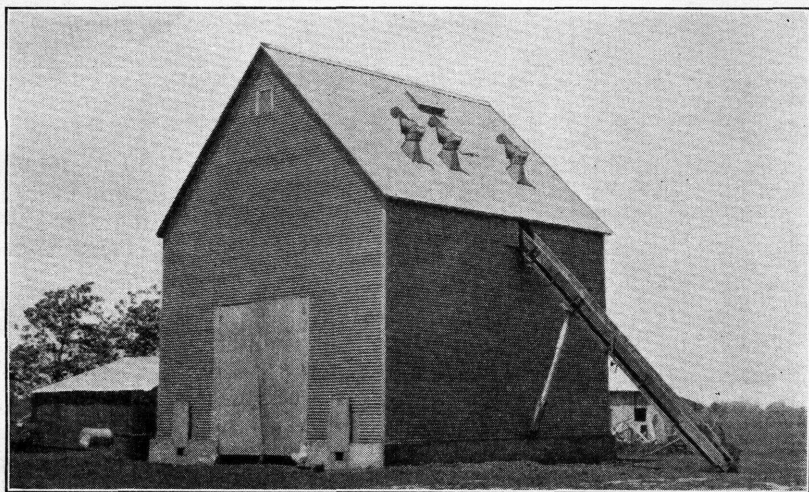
All-steel crib (steel framing, perforated-metal sides, and corrugated roofing) with portable elevator
